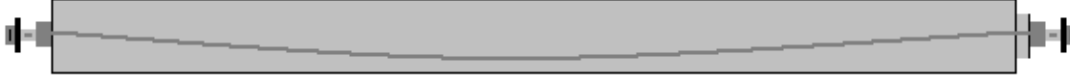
Organic anchorage, unbounded tendon and typical layout of prestressing cable for a simply supported beam
